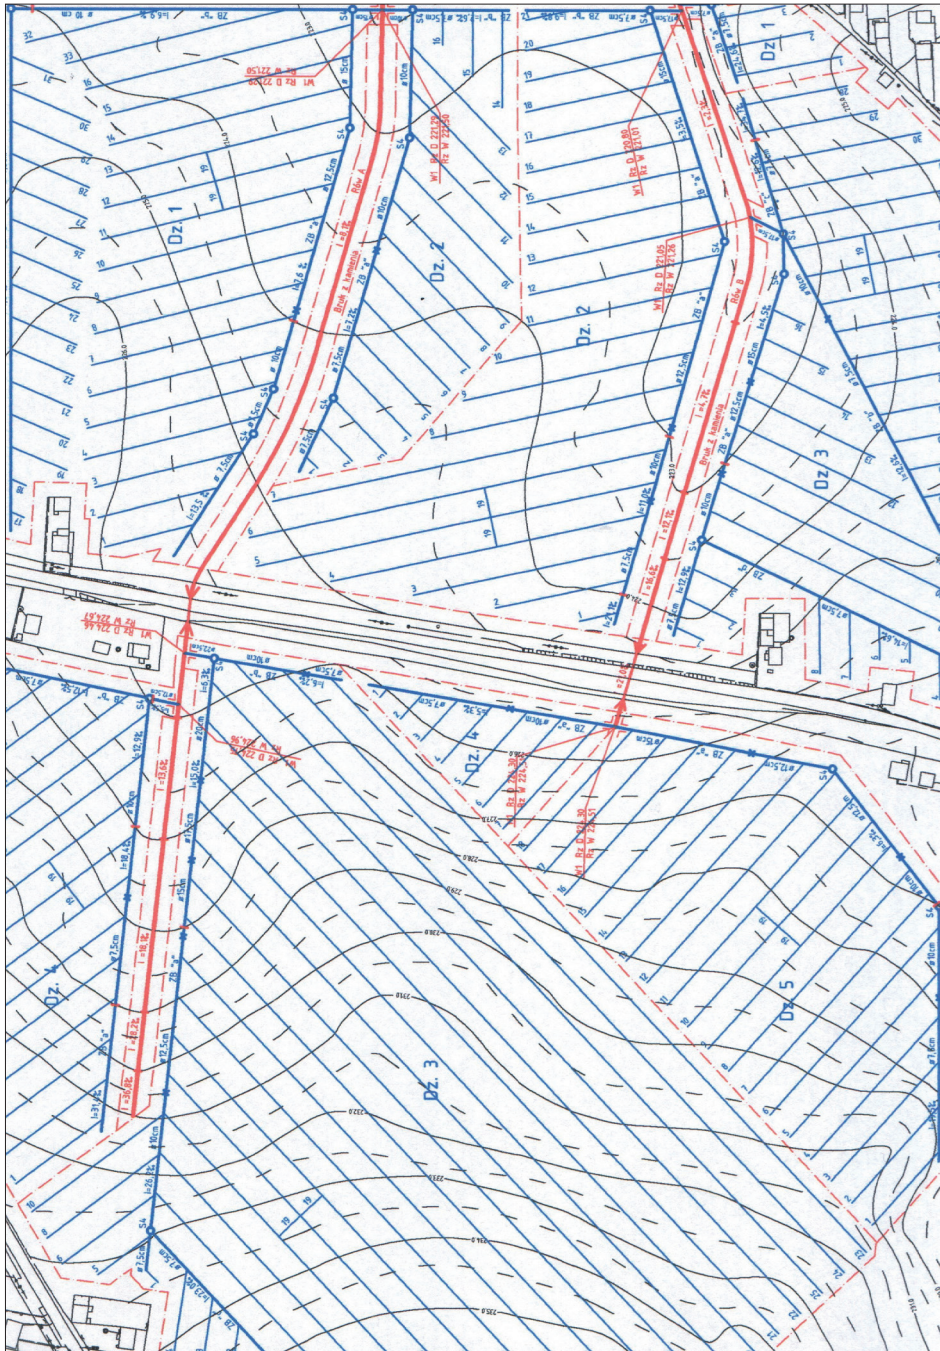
Altitude situation plan of drainage on the examined area in Rzozów village
